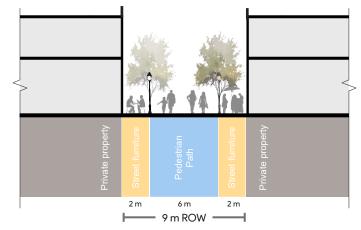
17: A typical 9 mt. Pedestrian ROW Section
